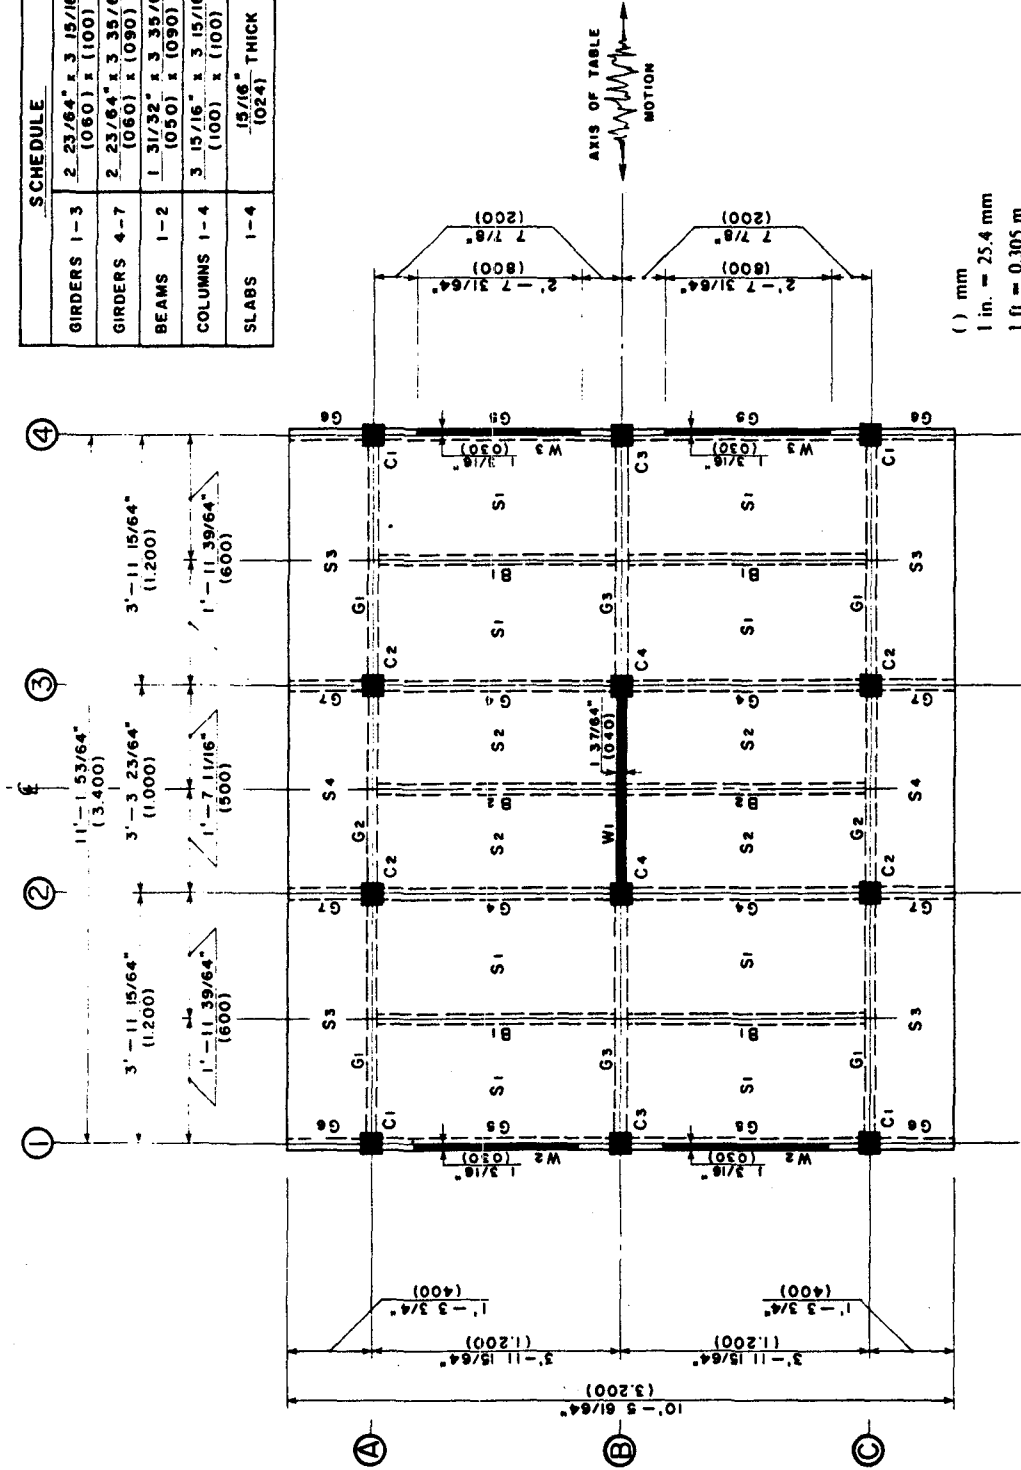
Typical floor plan of the 1/5-scale model
